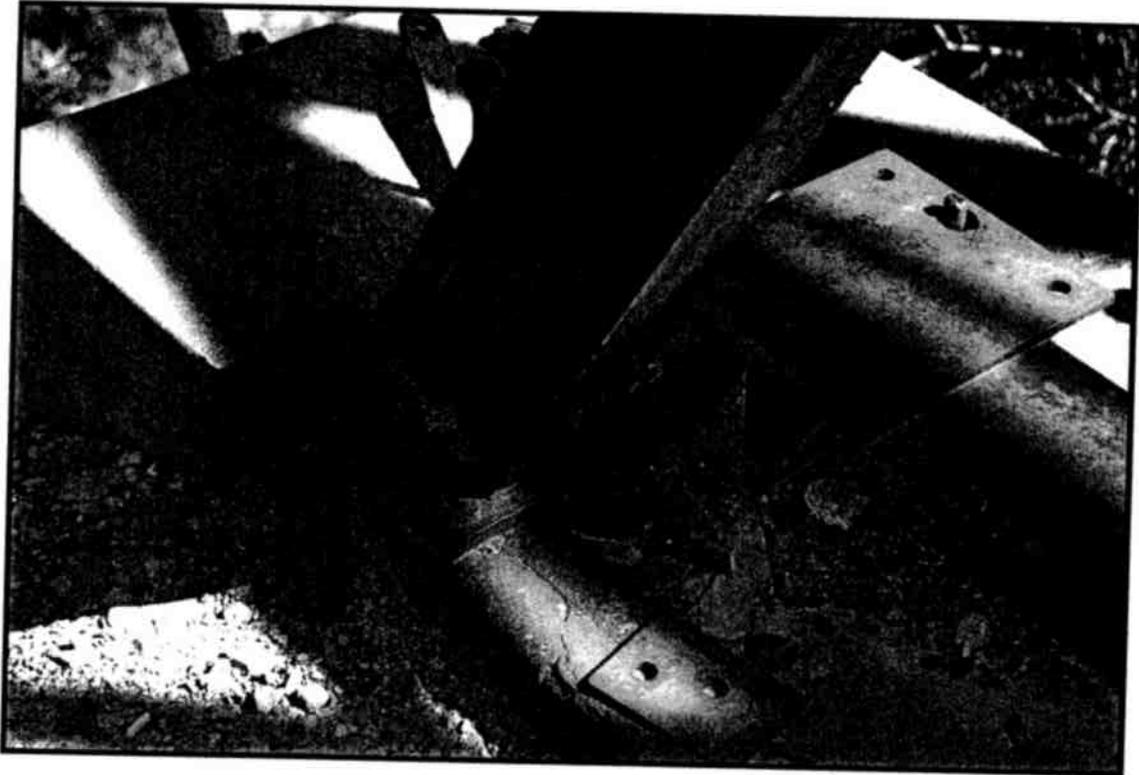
View of base connection of lateral bracing strut to top of concrete foundation. Note adjacent remaining support strut for original lateral bracing strut (Source: George Weaver, 2005. No copyright restrictions).
